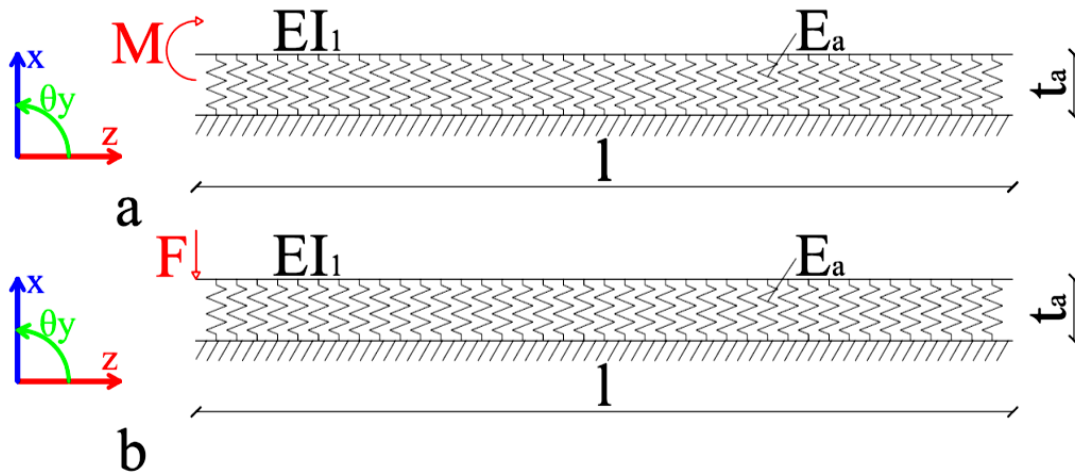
Structural diagrams per unit width of beam on elastic foundation with a moment load (a) and point load (b)
